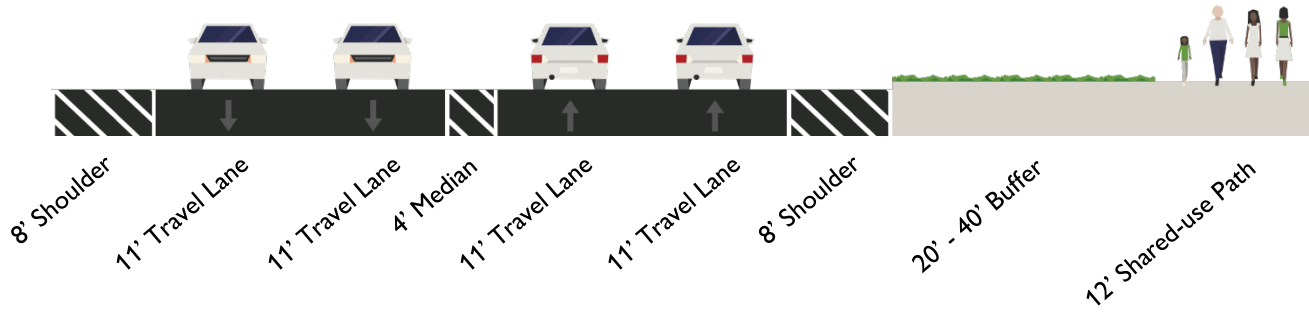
Highway 2 Typical Cross-section – E. 96th to E. 112th
